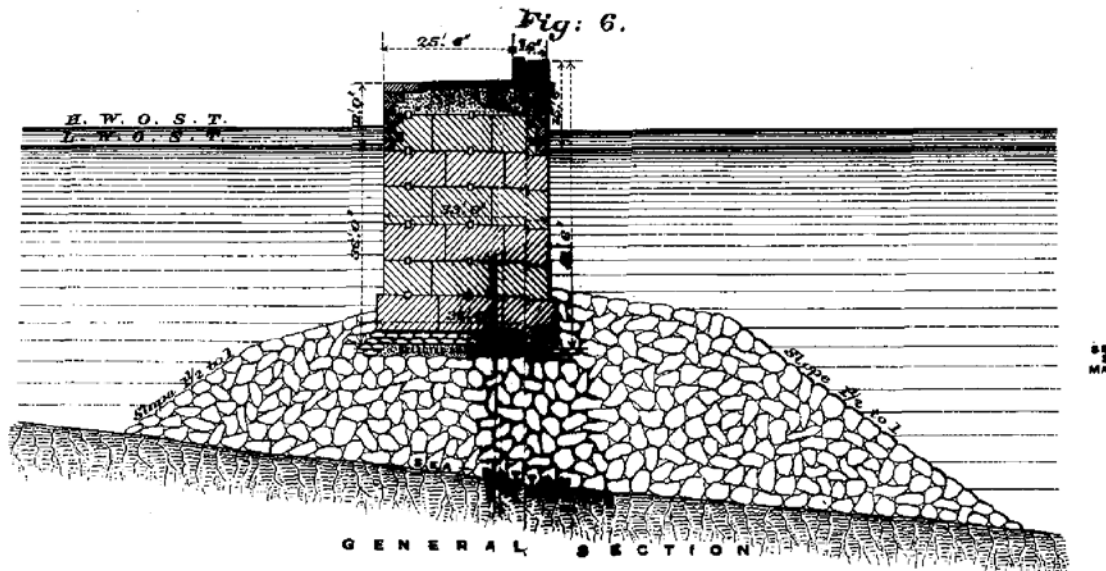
Shows a typical section through the detached mole (Scott 1914)
